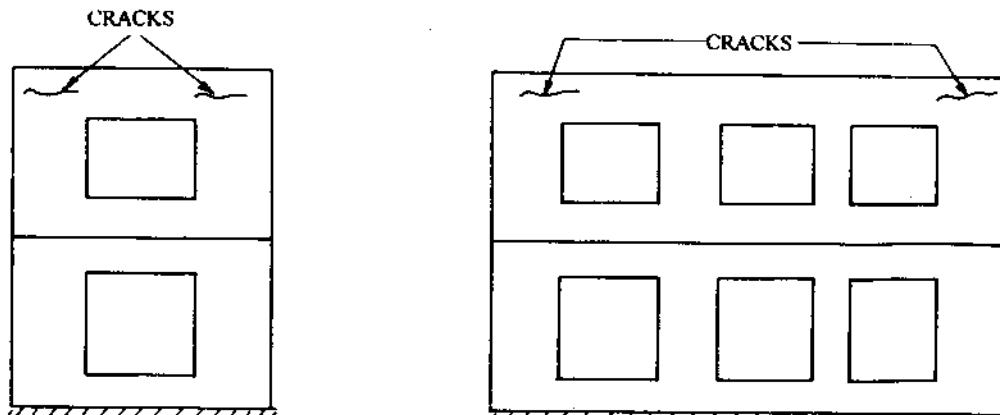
Horizontal cracks in top story below slab due to lifting of corners
